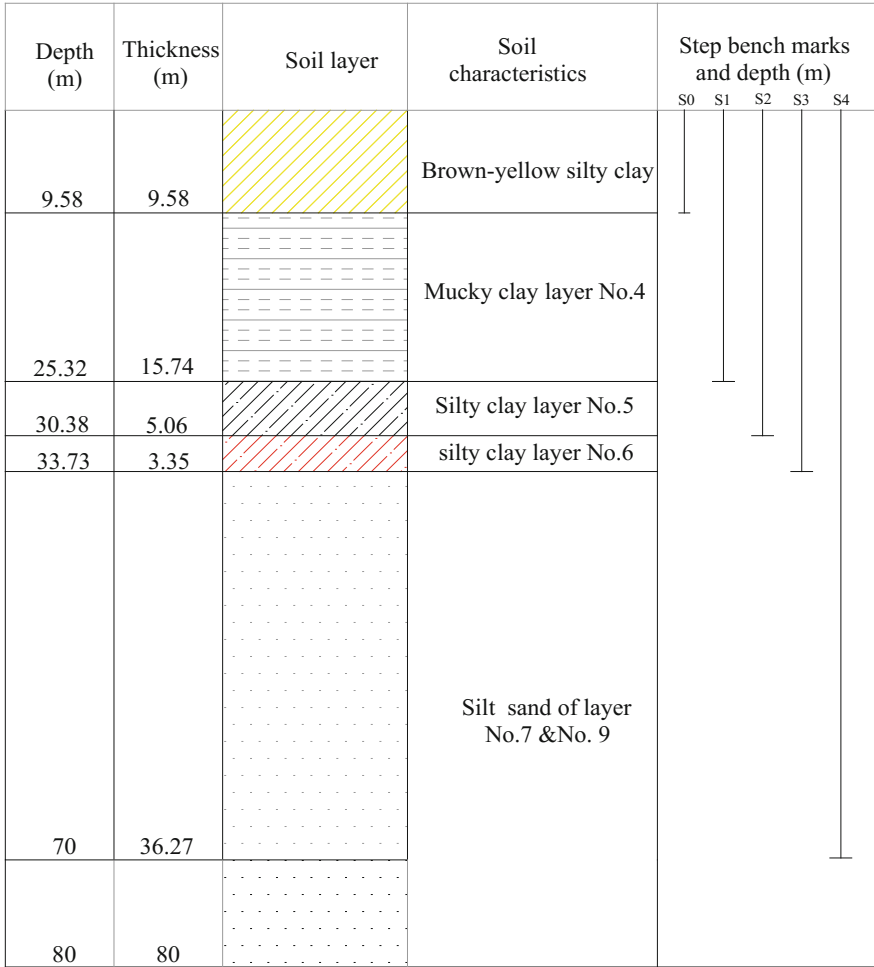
Drill column section of soil layers in Lujiazui area
